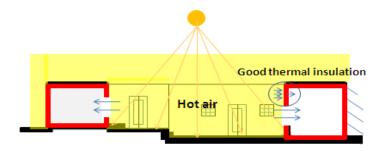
Heating system 1; in the morning (winter); opening the windows to allow air cold to enter.
